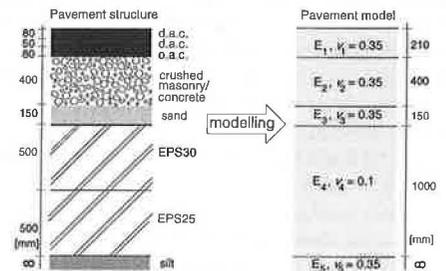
Flexible pavement structure model used in back-calculations of layer E moduli.
